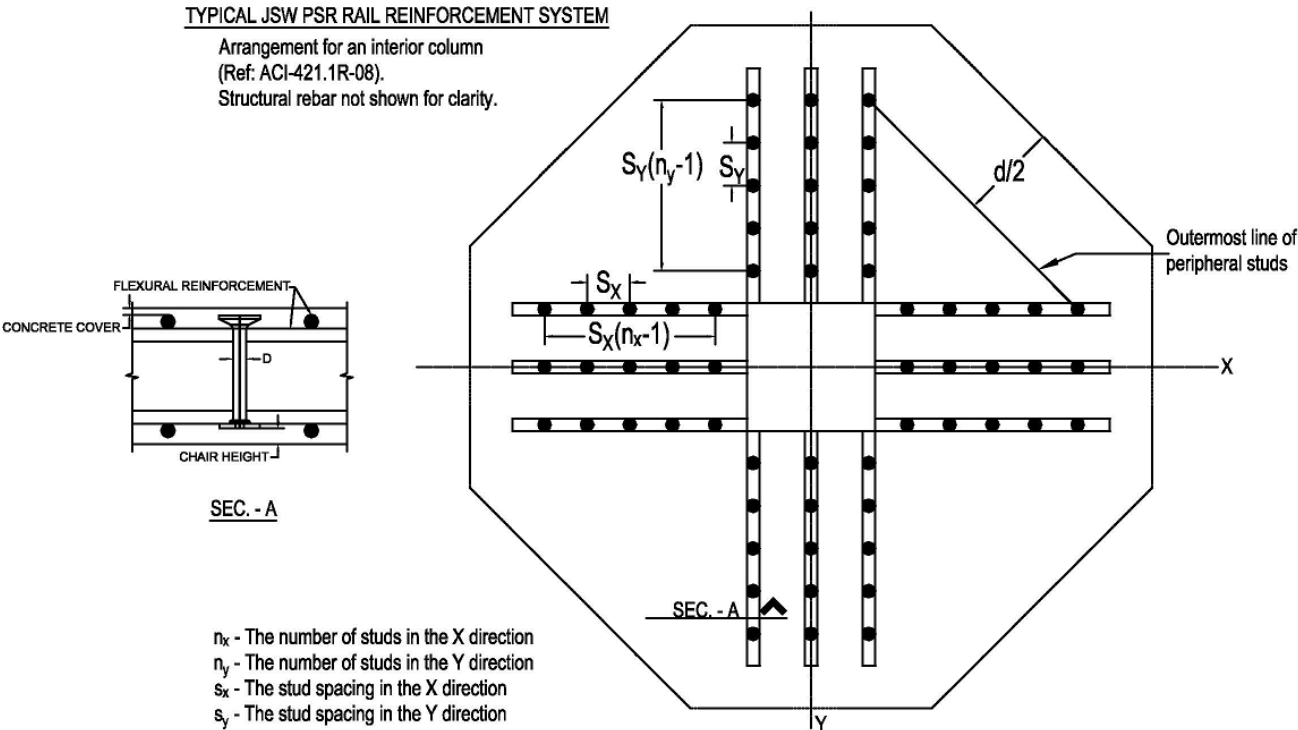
TYPICAL JSW STUD RAILS REINFORCEMENT SYSTEM DETAILS
